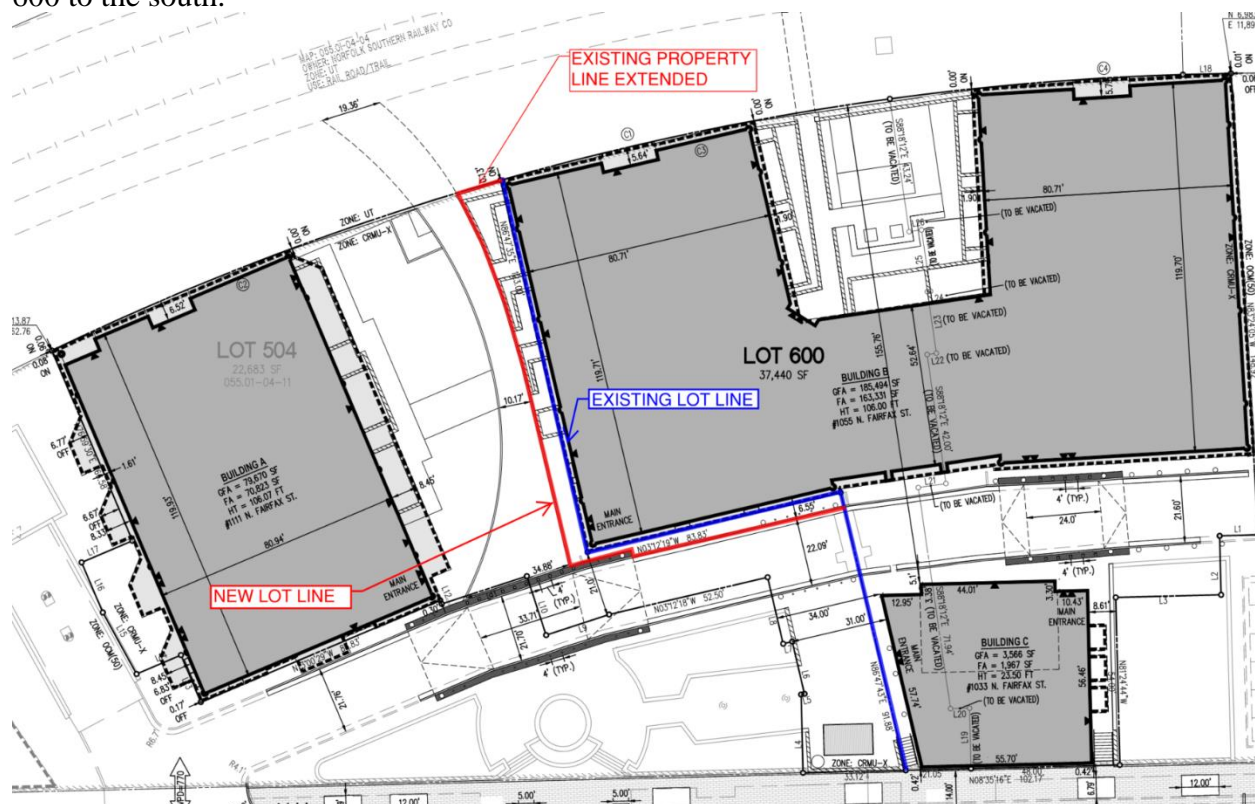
Proposed subdivision boundary of Lots 504 and 600
